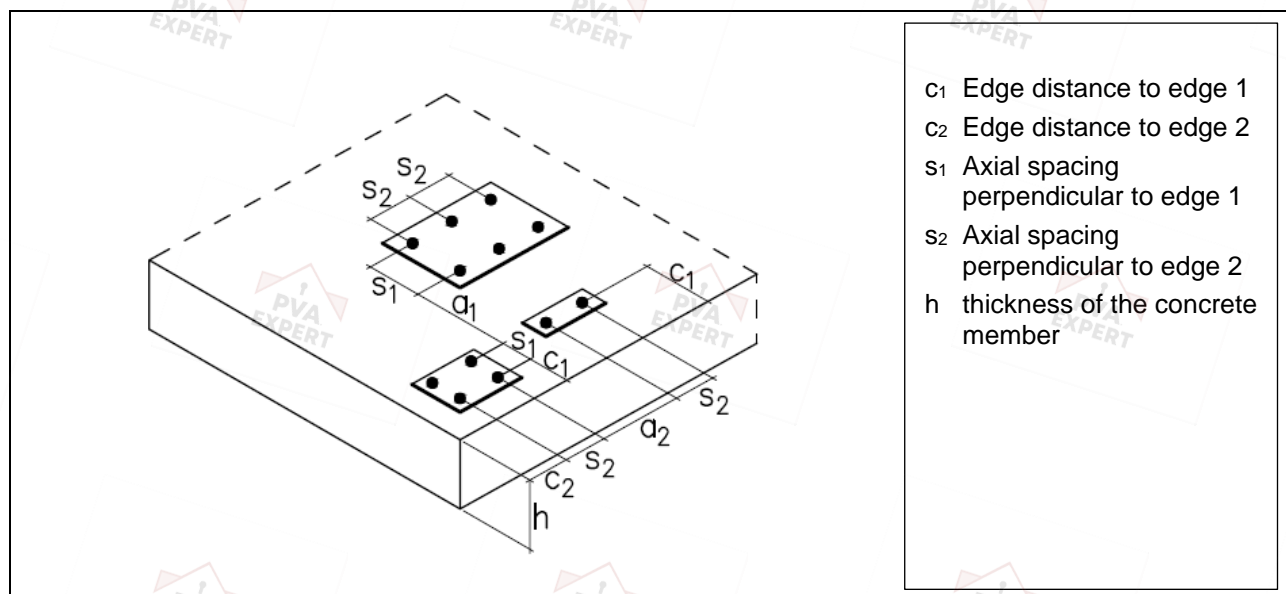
Definitions - concrete member, fastener spacing and edge distance
